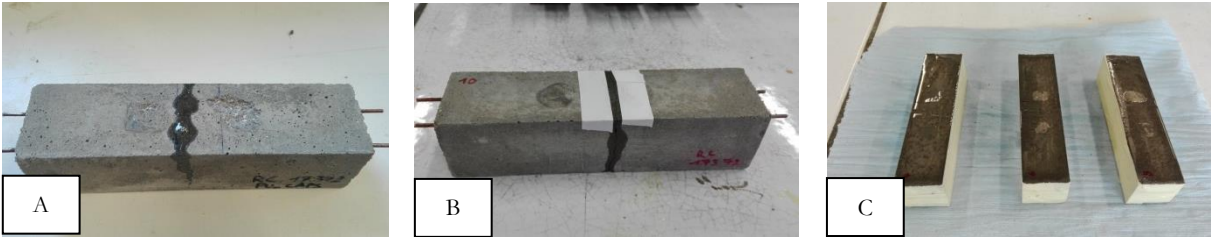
DIFFERENT HEALING MECHANISMS APPLIED ON THE MORTAR PRISMS; (A) CAPSULE BREAKAGE, (B) CRACK INJECTION, (C) WRA SPRAYED ON TEST SURFACE
